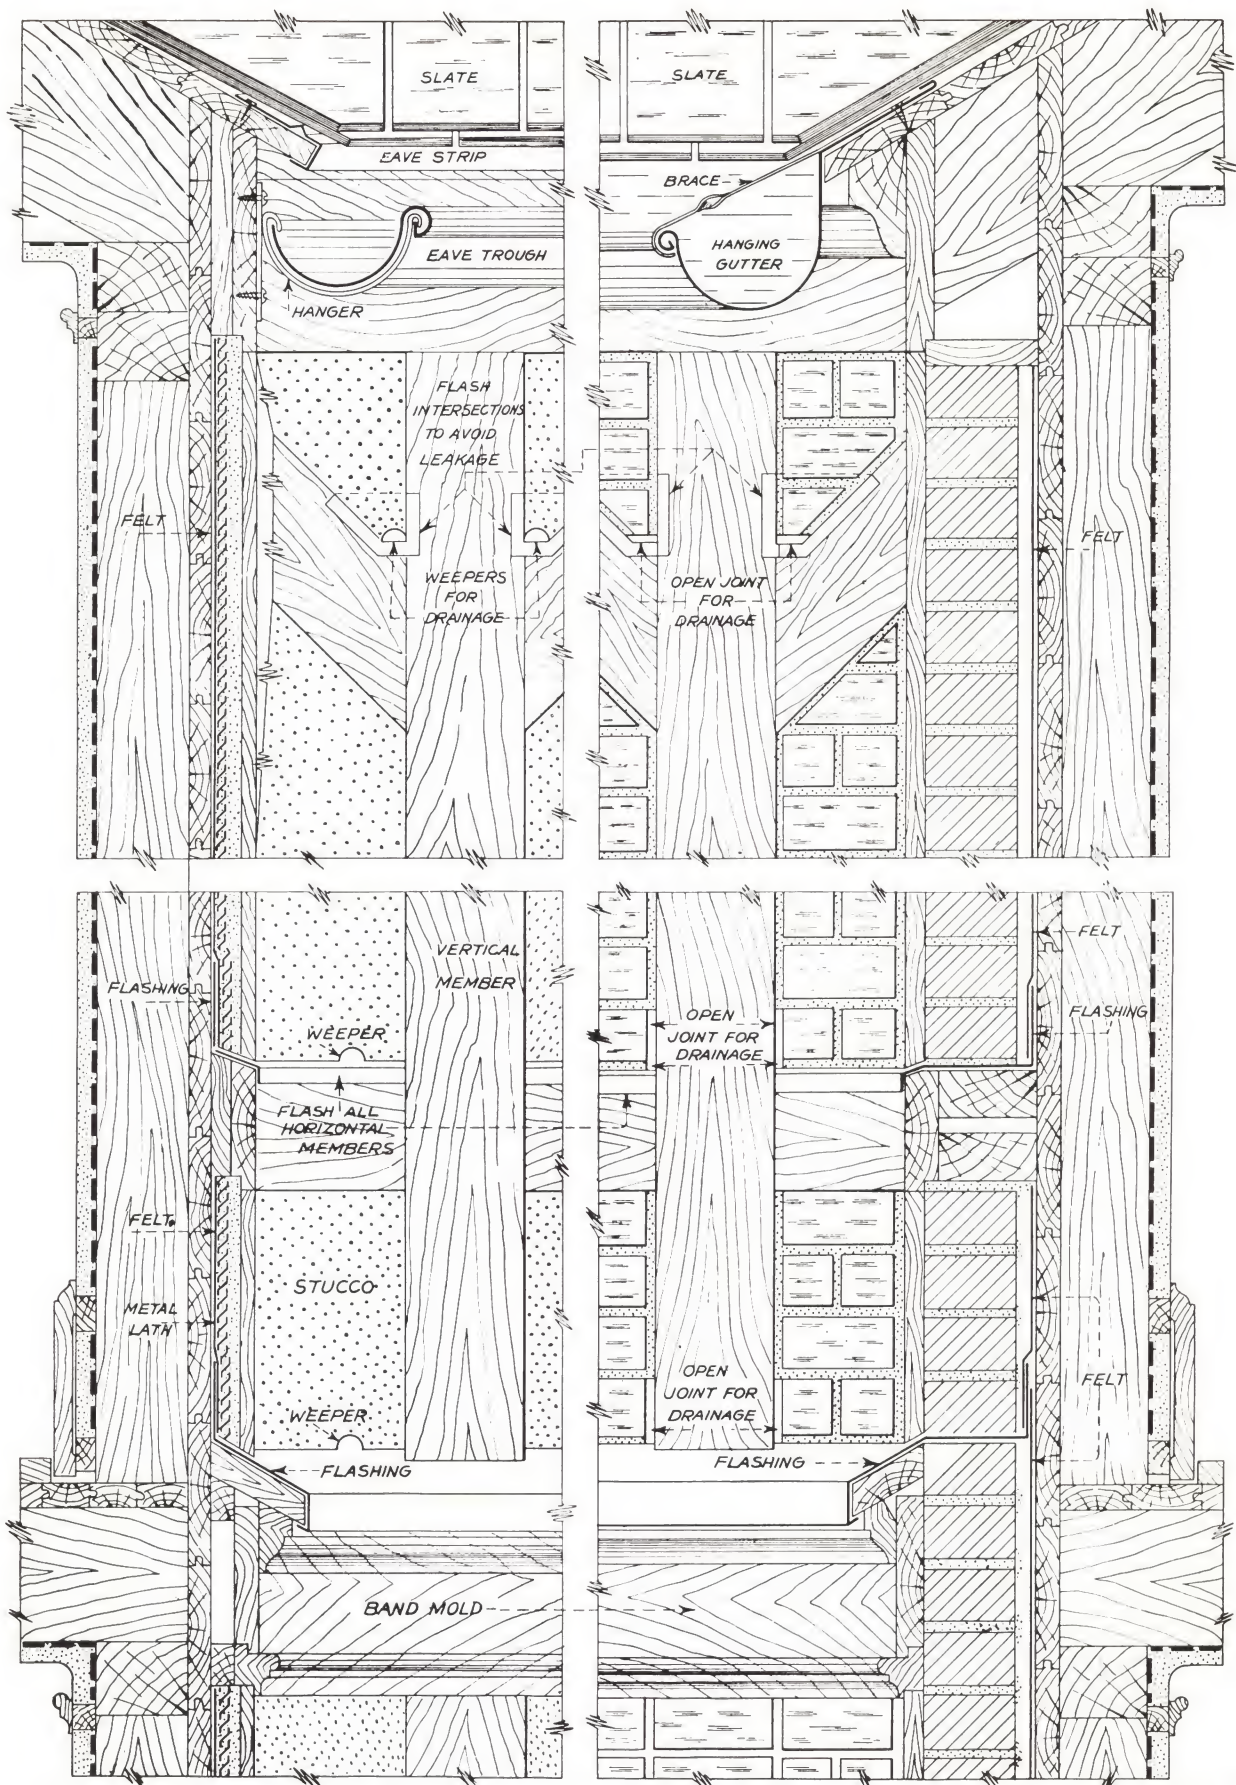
METHOD OF FLASHING ON STUCCO WALL — SCALE  $1\frac{1}{2}'' = 1'-0''$  — FIG. 2 METHOD OF FLASHING ON BRICK VENEER WALL
